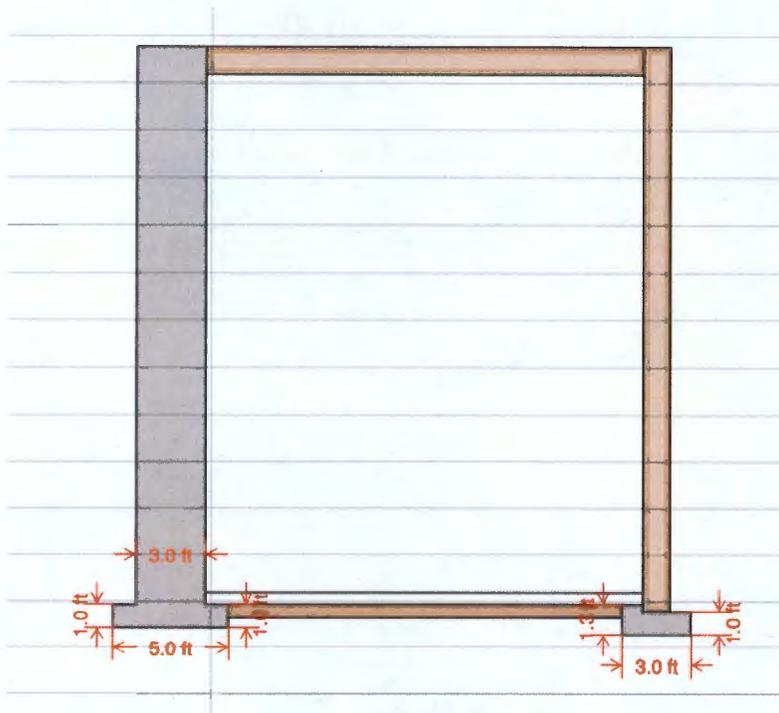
Geometry used in Evaluation of Ultimate Bearing Capacity of Tunnel 1 Footings
